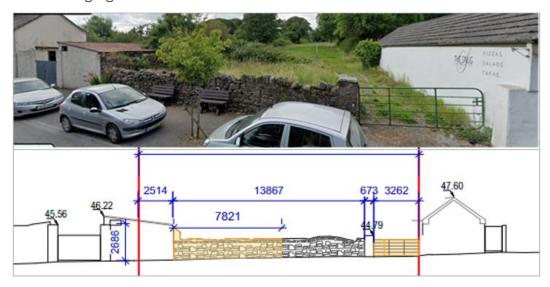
Photo of existing wall and gate at front of Village Car Park Site (Top) and Extract from Demolition Plan showing extent of existing wall and gate to be removed (Bottom)
